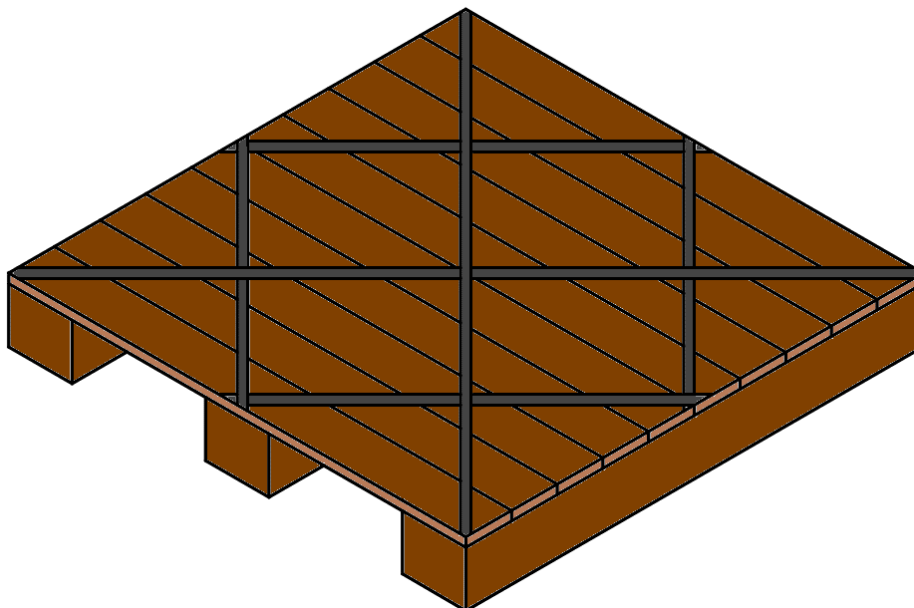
Reinforced timber floor by adding FRP sheets and bands.
